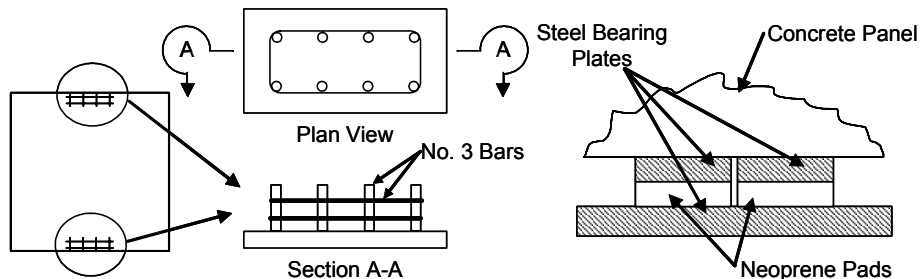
continued: Reinforcement layouts for isolated strut tests
